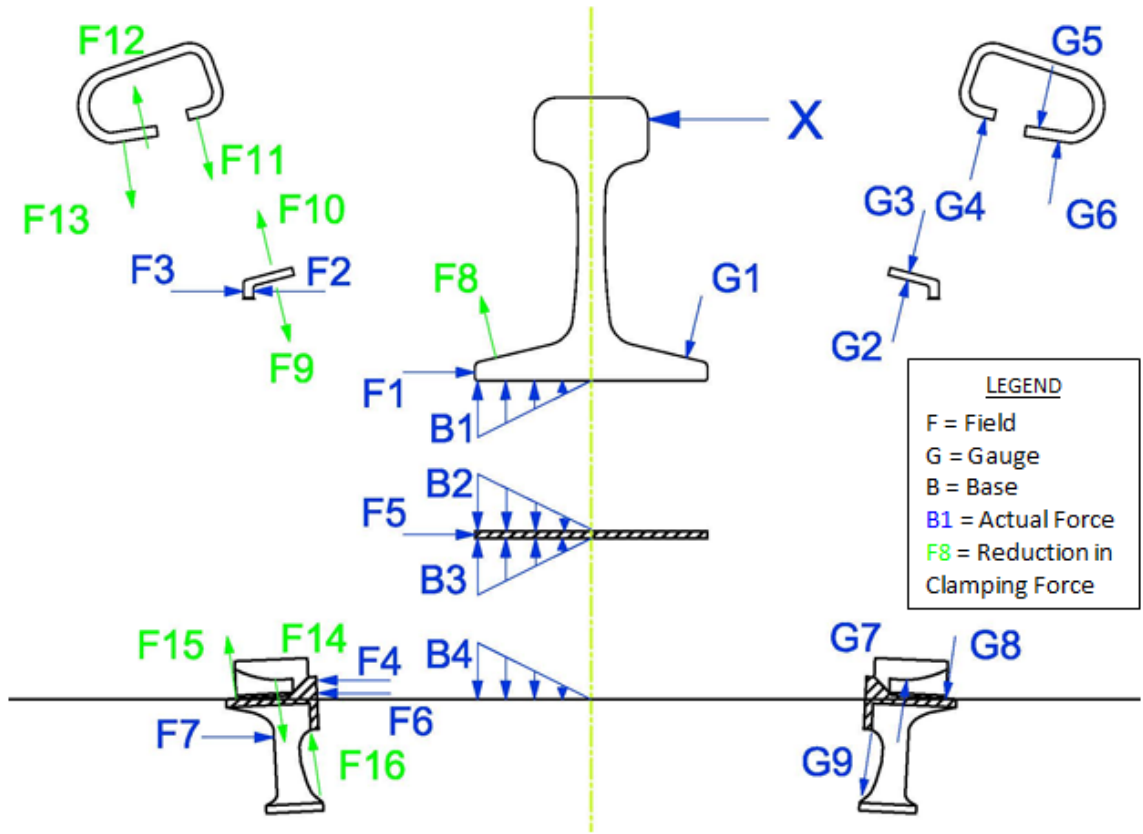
Revised concrete cross-tie fastening system load path map: case (c), forces due to lateral external load (deformable bodies)
